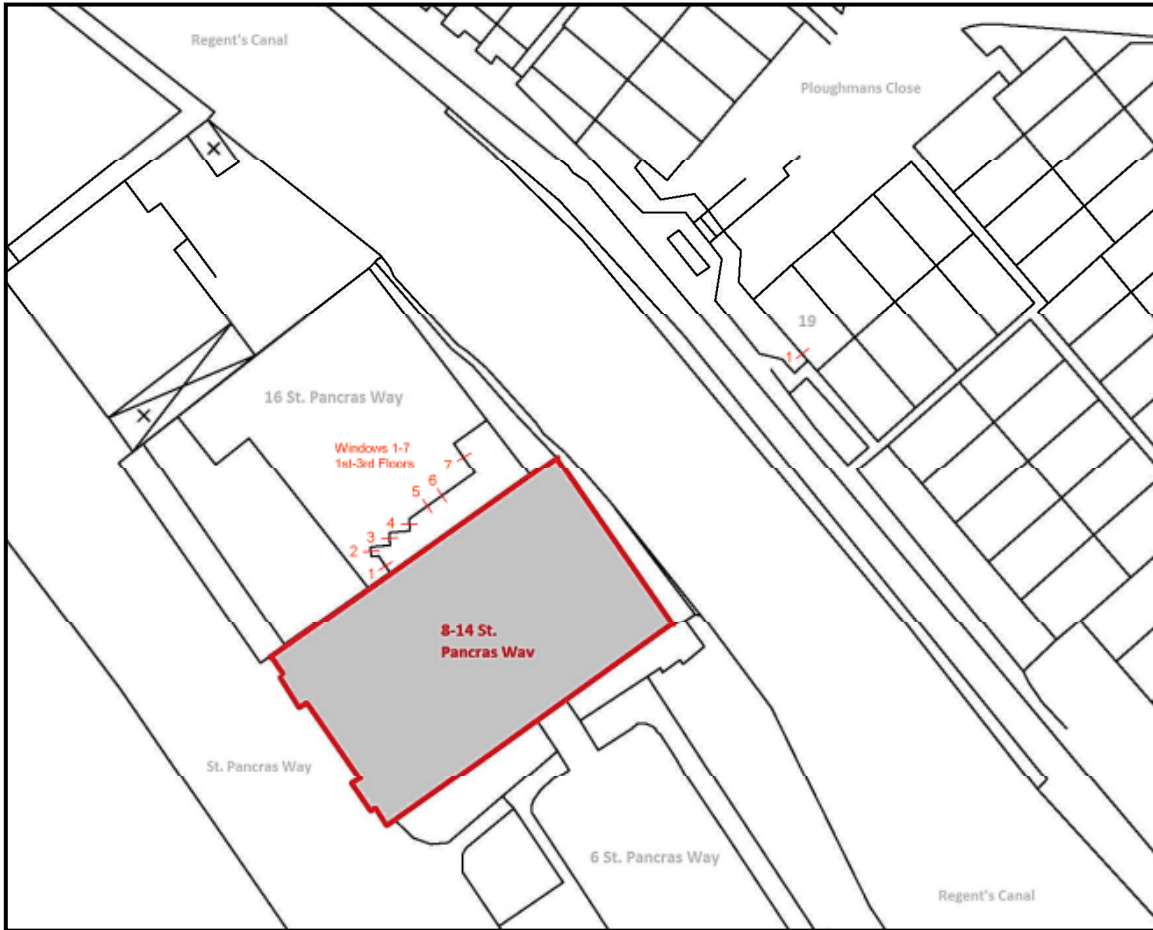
Sunlight and Daylight Assessment Location Plan for Existing Residential Properties
